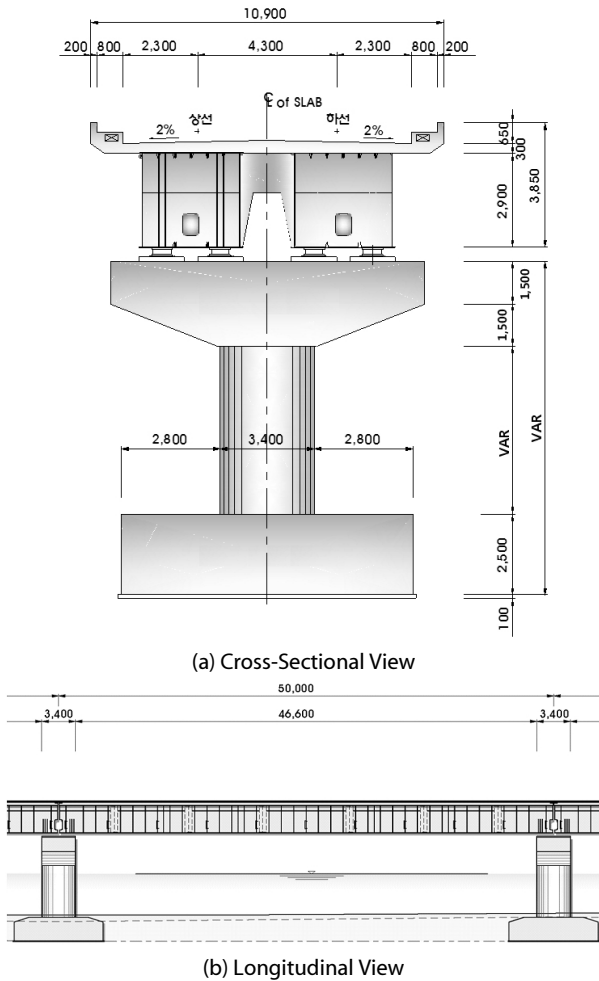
Drawings of a Sample Steel Box Girder Bridge (Unit: mm)
